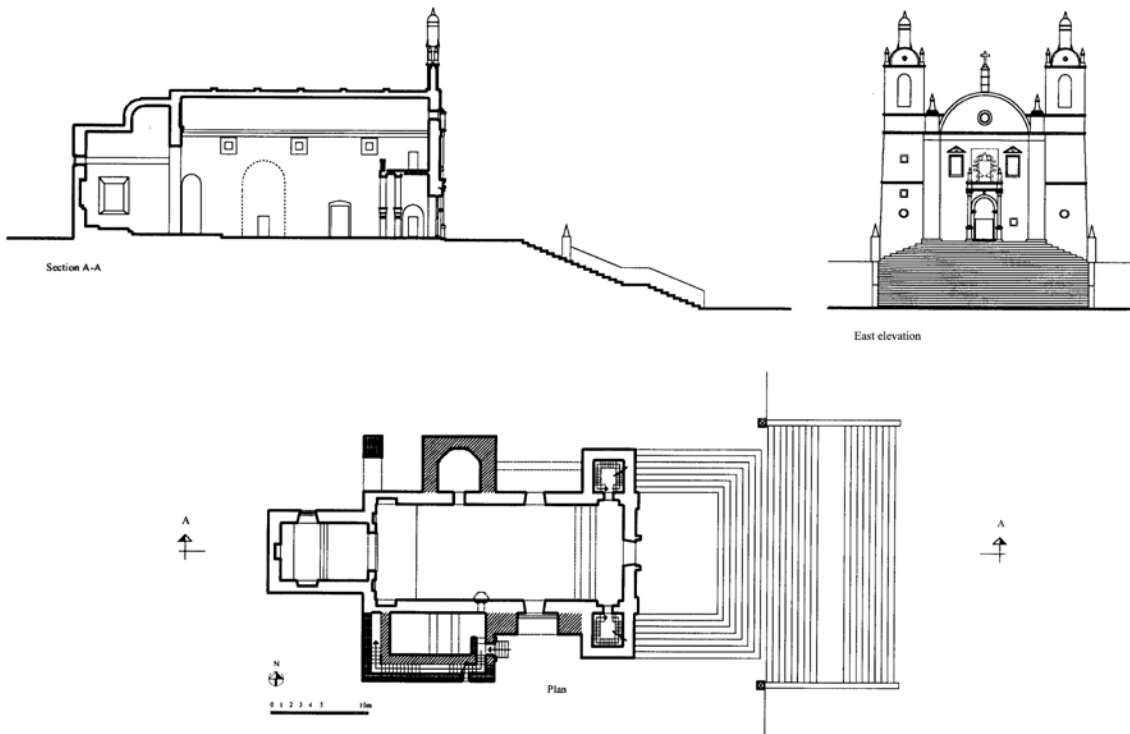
St Thomas's church (81), plan, longitudinal section A–A, showing the *cruzeiro* to the north, and the east elevation. The hatched areas are later additions, serving as the vestry and rectory, but modern additions – unrelated to the church – are not shown.
